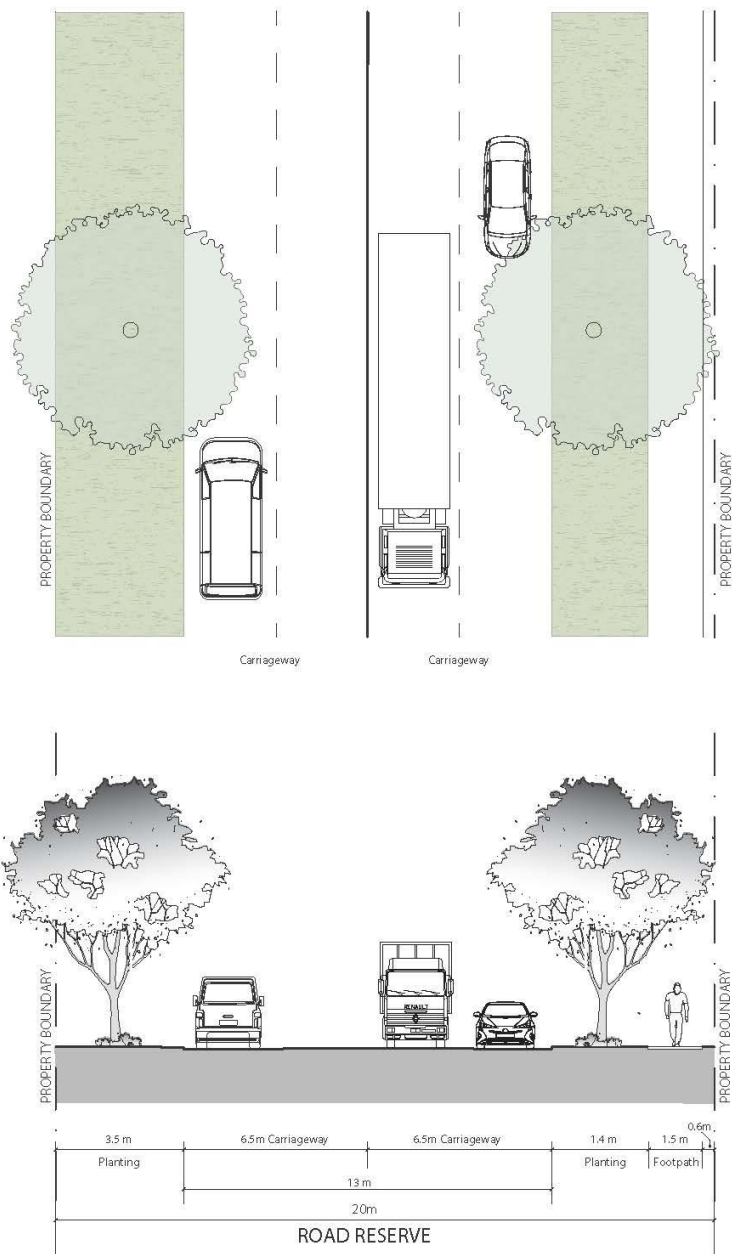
B: Employment Land Street with Footpath (Road Section B as per Figure 3)
